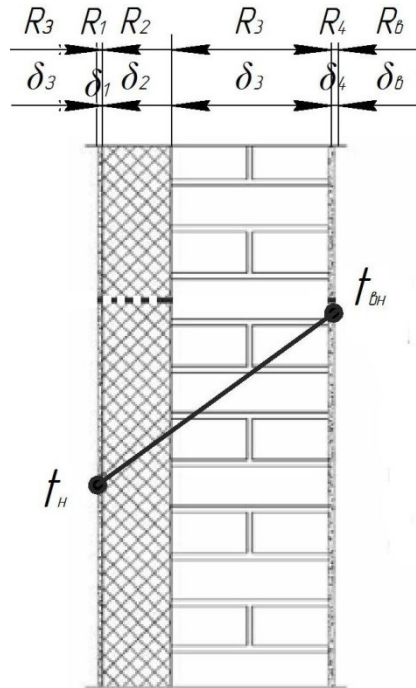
Scheme of heat brick exterior wall with external insulation system
